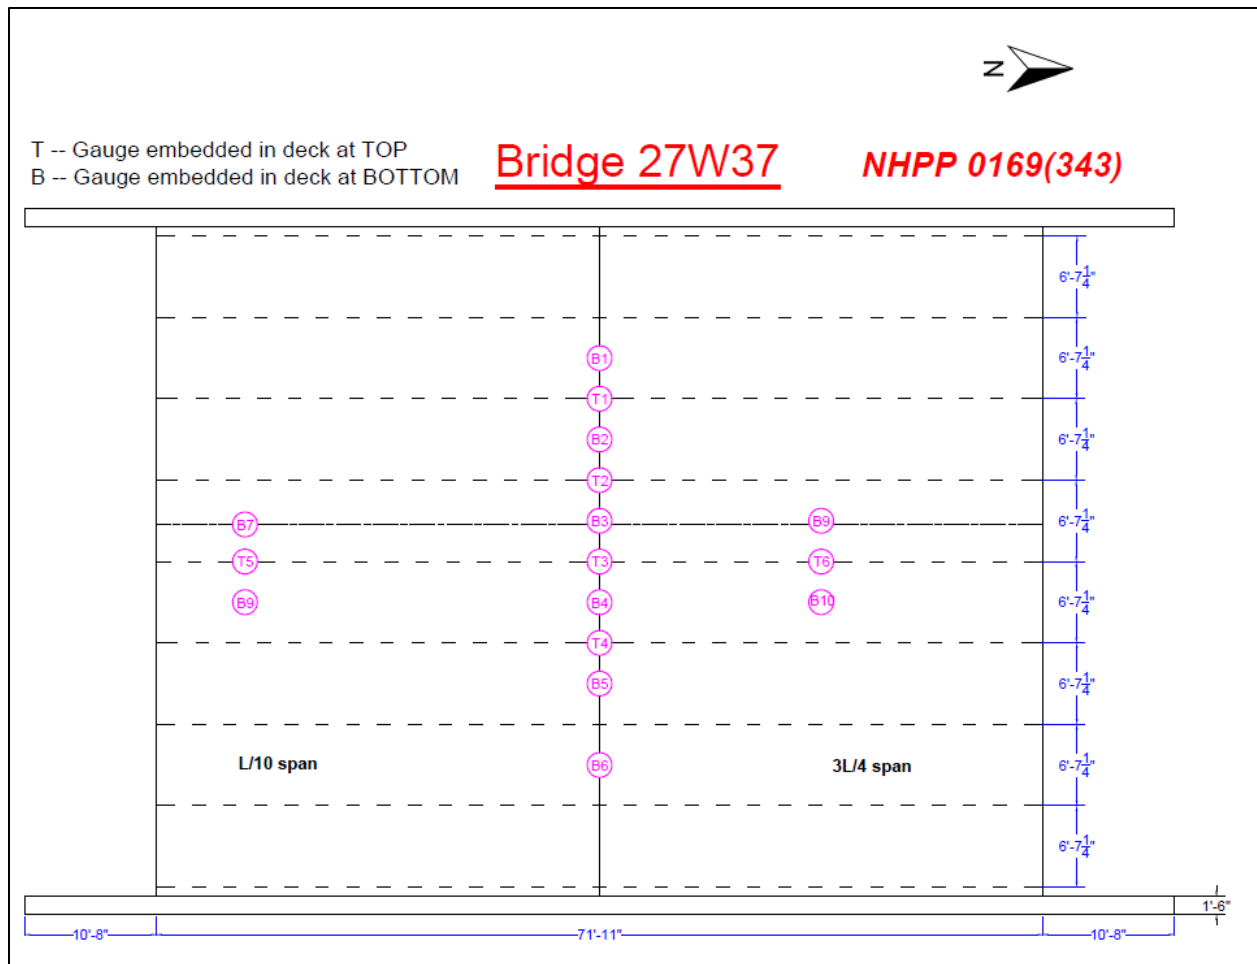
Instrumentation layout for long-term monitoring in GFRP-reinforced bridge deck (27W37)
